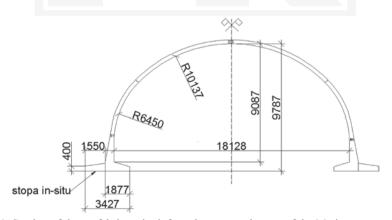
Section of the prefabricated reinforced concrete element of the Matiere system arch
